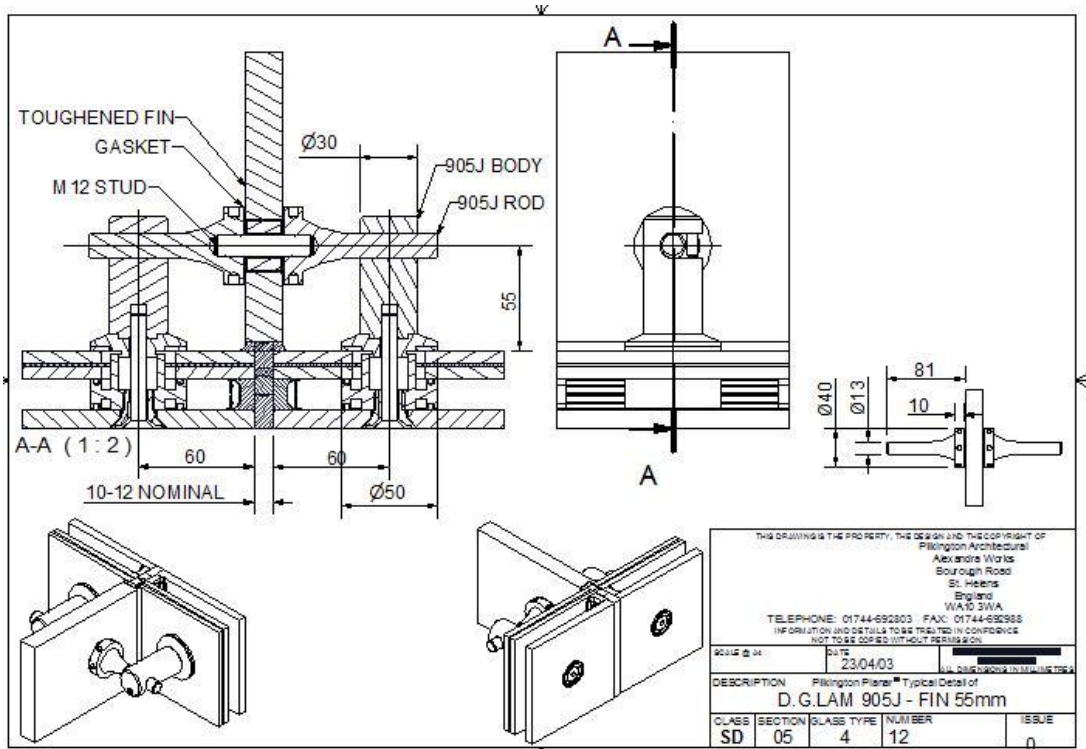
2-Point Connector to Glass Fin from Double Glazed Glass for Curtain Wall Detail (Pilkington, 2009)
